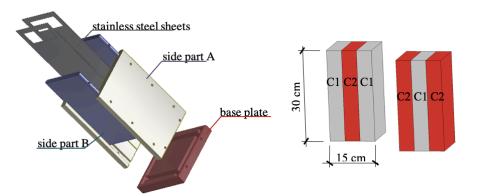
Formwork construction and test specimen construction and dimensions.
